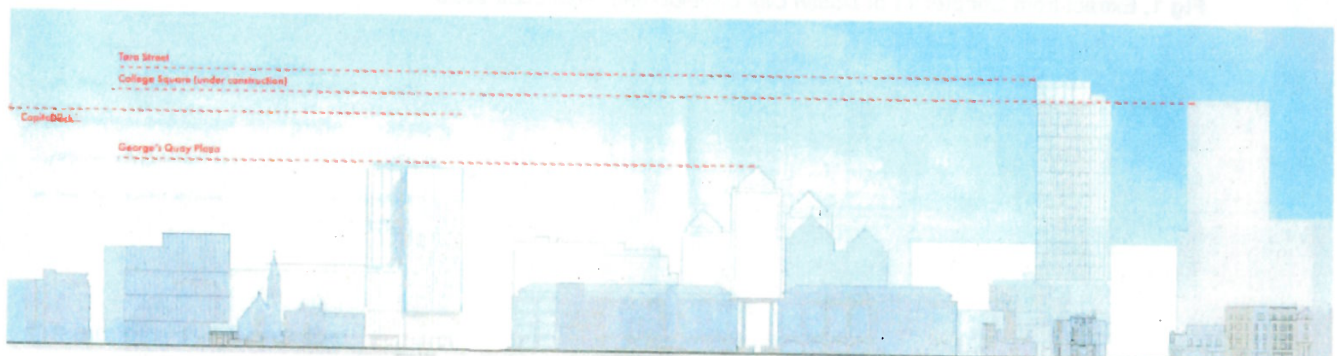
Extract from Architectural Design Statement (Henry J Lyons) (pg. 4) prepared on behalf of applicant.
